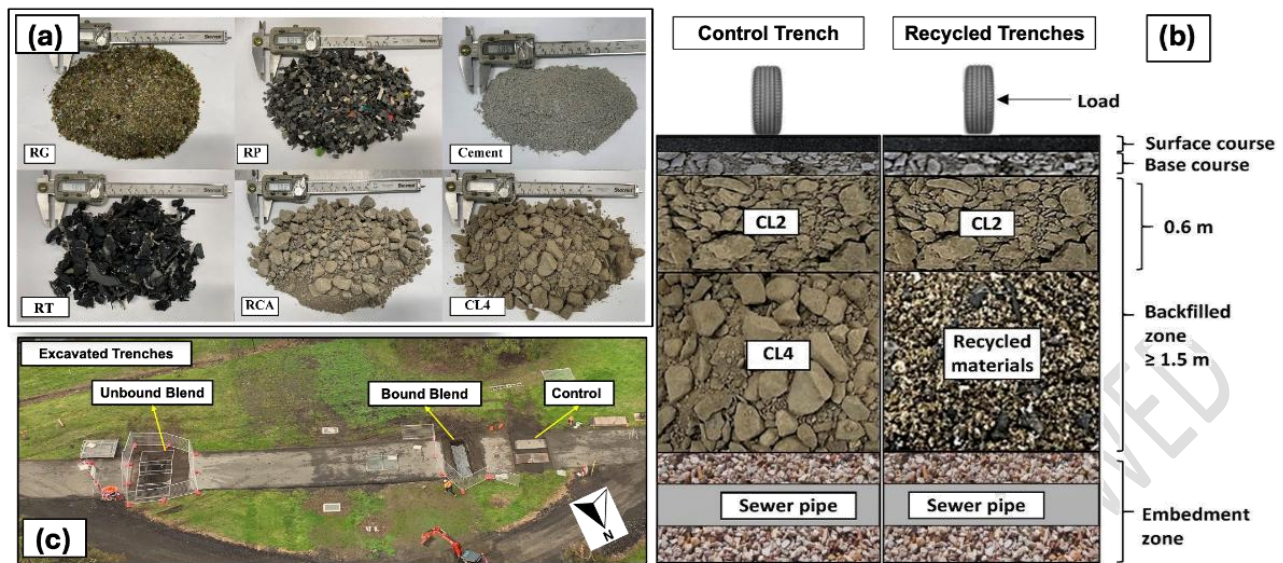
Images of (a) individual materials, (b) Cross-sectional layouts, and (c) bird view of the site with excavated trenches.
